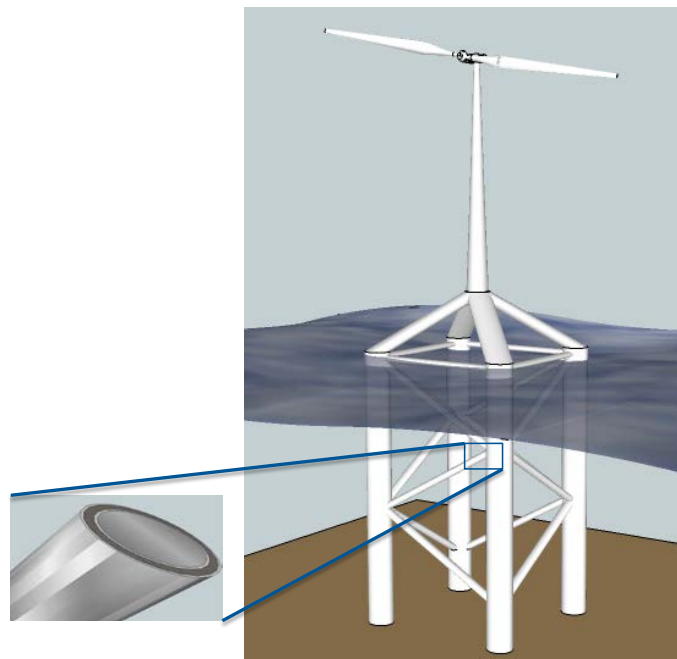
Innovative sandwich - adhesively bonded jacket trusses
